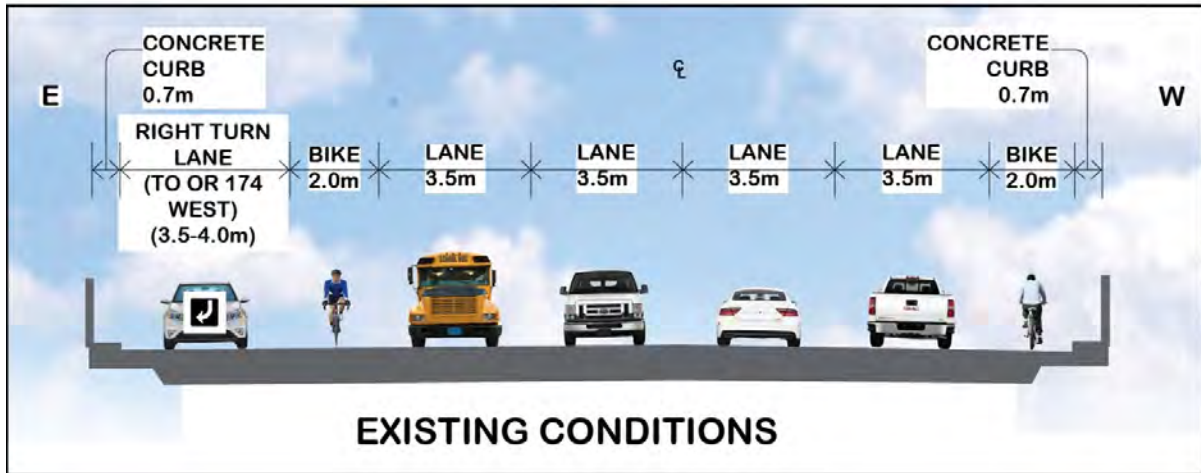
Existing Blair Road/OR174 Bridge Cross-Section
